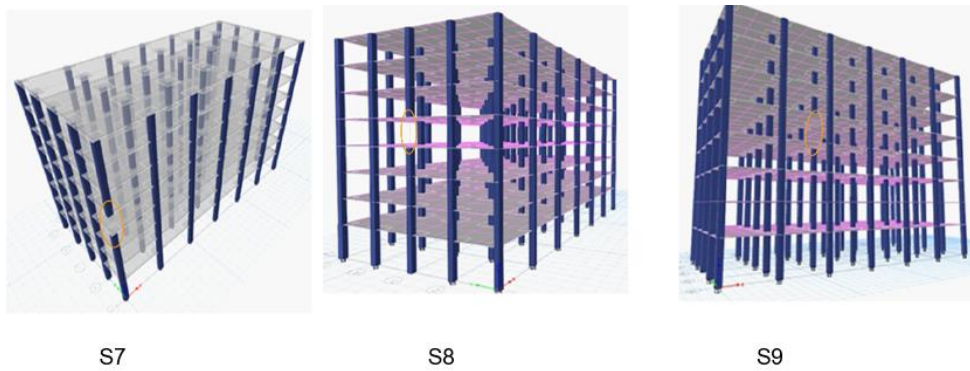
Details of the model with static column removal for flat slab with drop panel building
